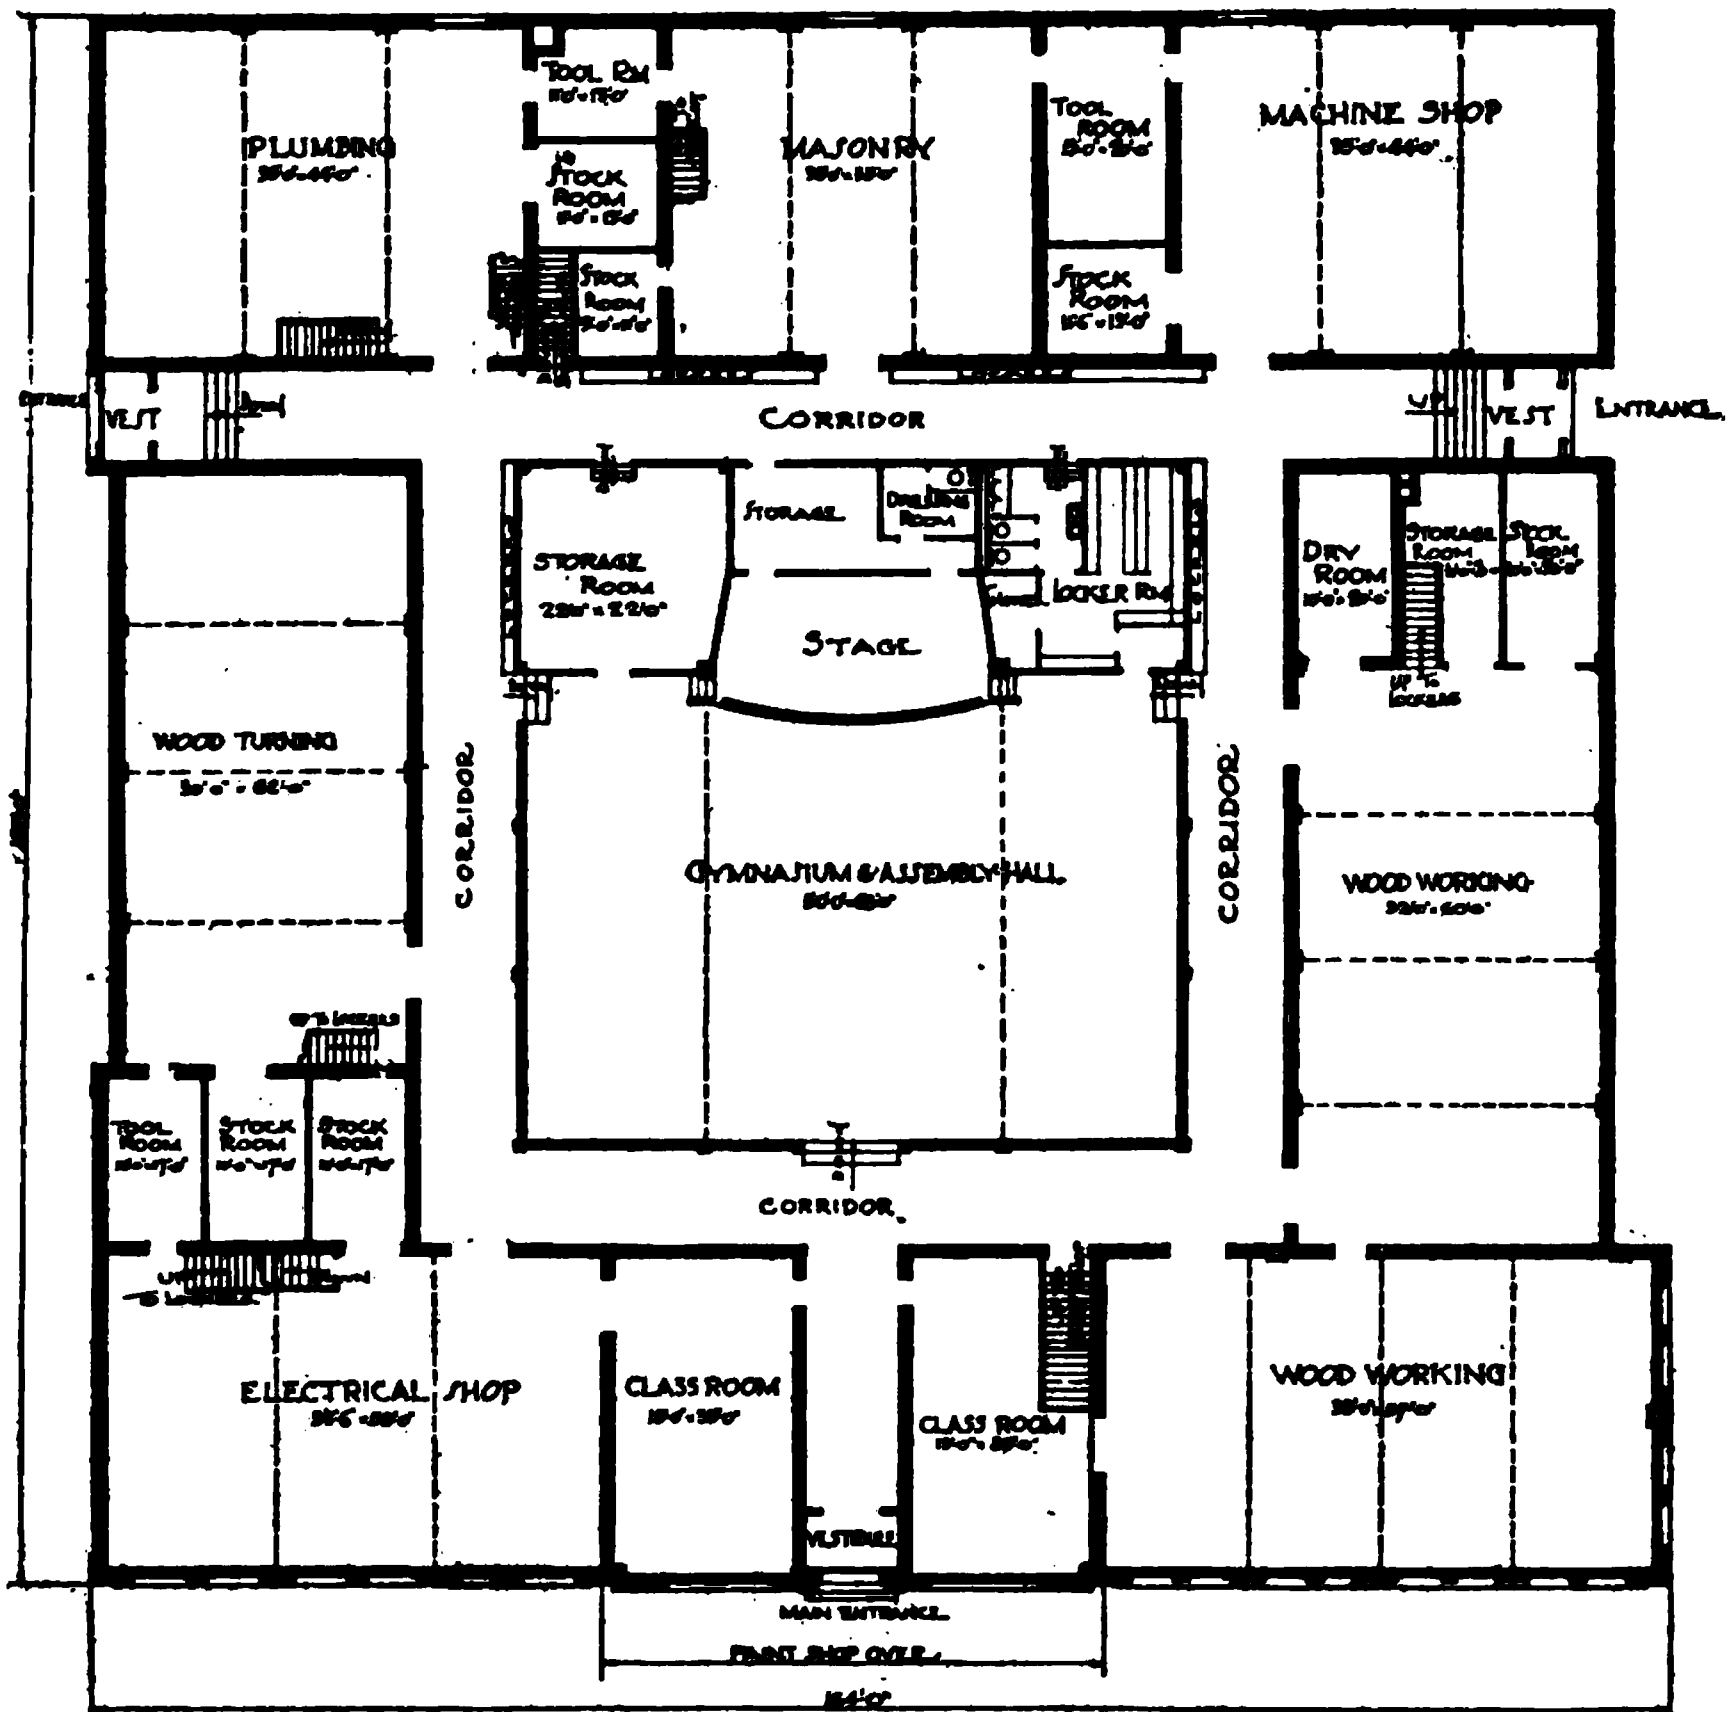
Floor plan, shop building, Lathrop School of Mechanical Trades, Kansas City, Mo., showing as a type plans of an old main building of brick erected in 1900 for regular graded school work, remodeled in 1911 as a boys' industrial and trade school, to which new shop buildings of modern factory type are being added in units, the first two being completed in 1916 and 1917, respectively.
